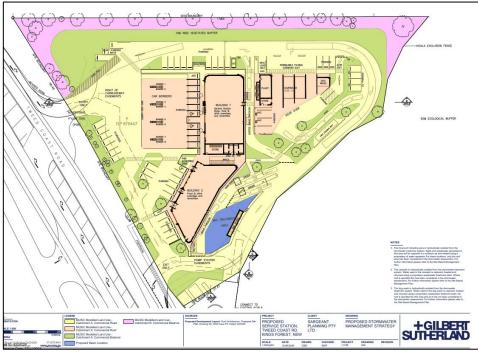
Extract from Revised Conceptual Stormwater Report – Proposed Stormwater Management Strategy
